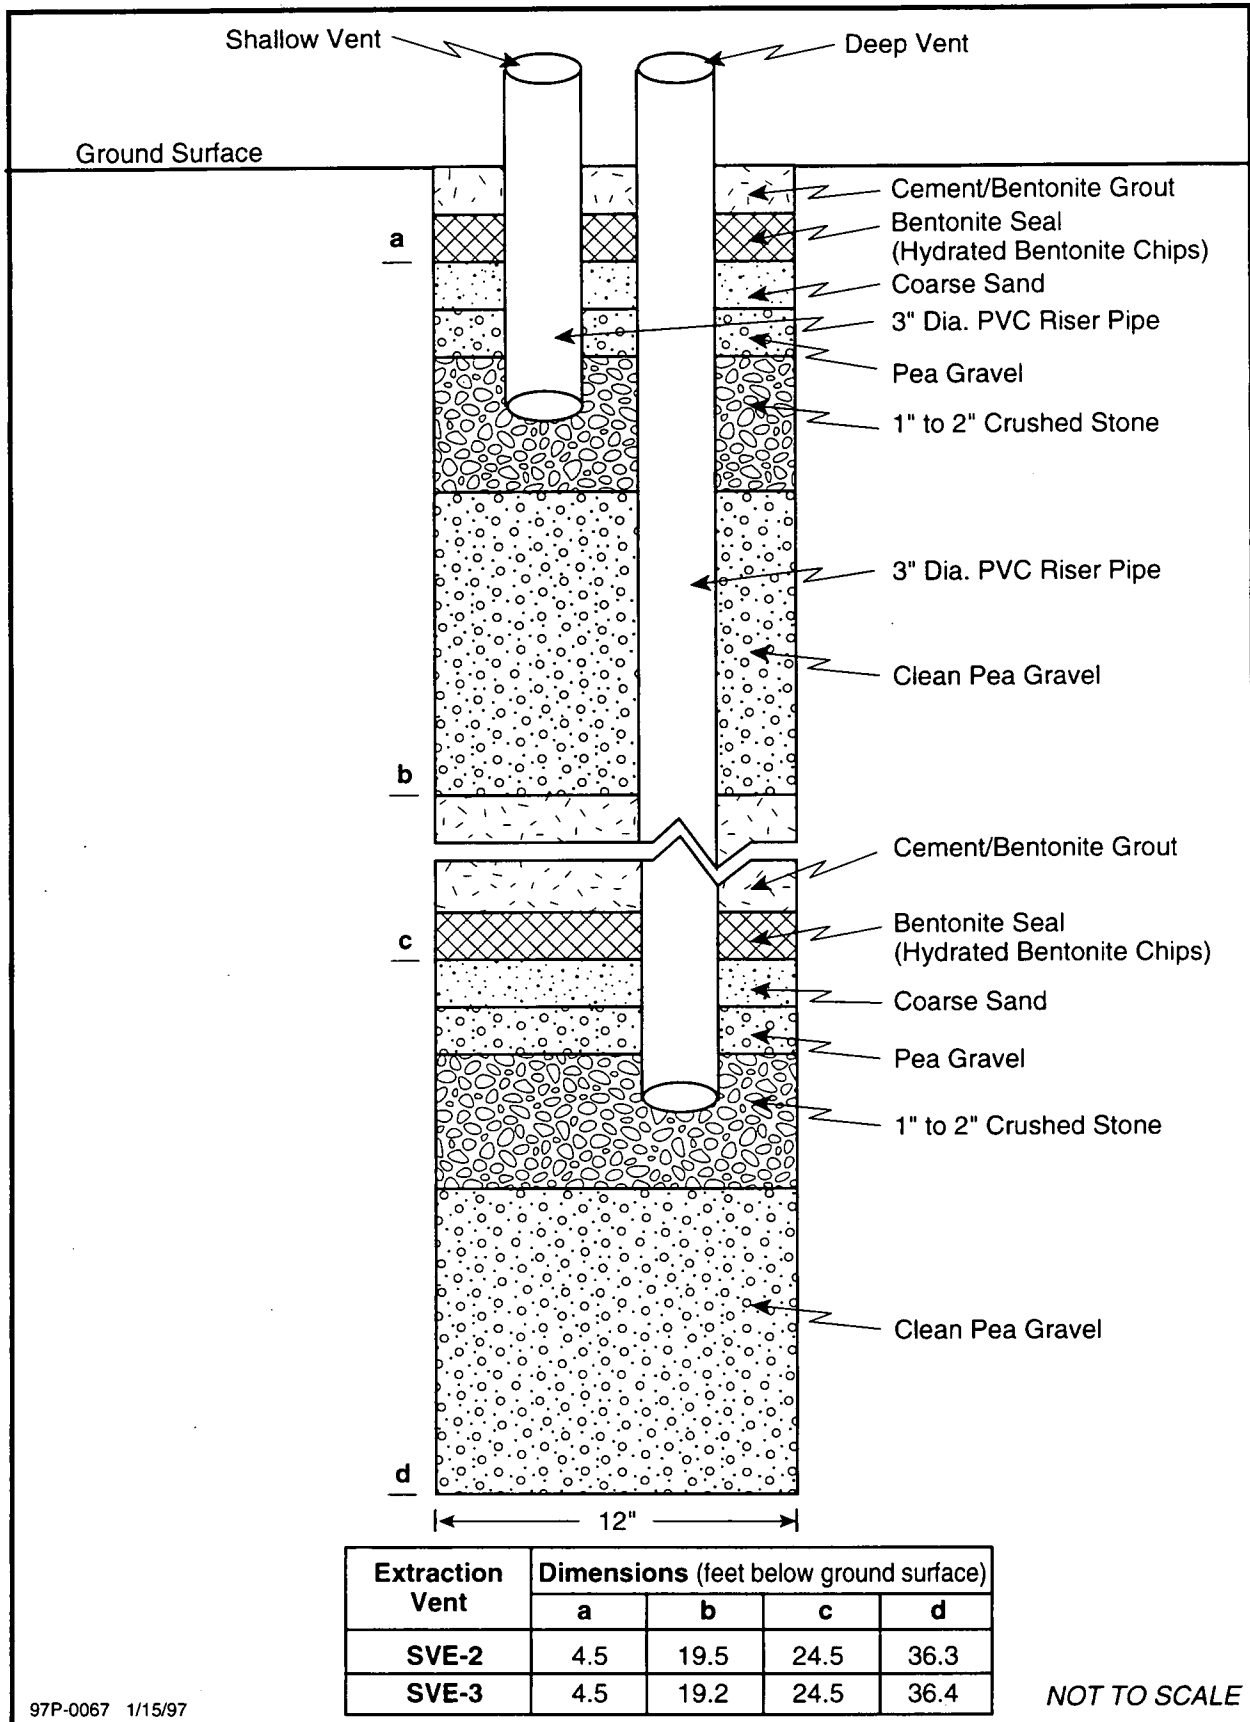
CONSTRUCTION DETAILS OF NESTED EXTRACTION VENTS AT NORTHEAST CORNER OF BUILDING
